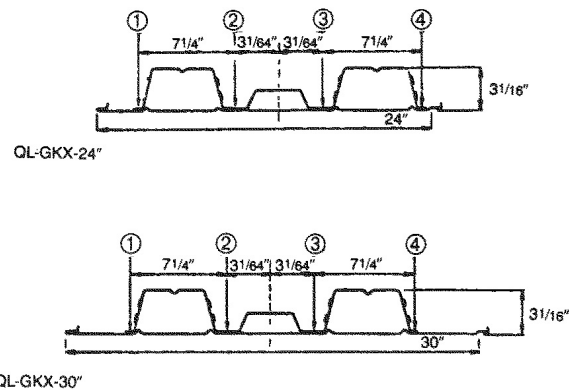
a.—FLUTE NUMBERS FOR PUDDLE WELD LOCATIONS
